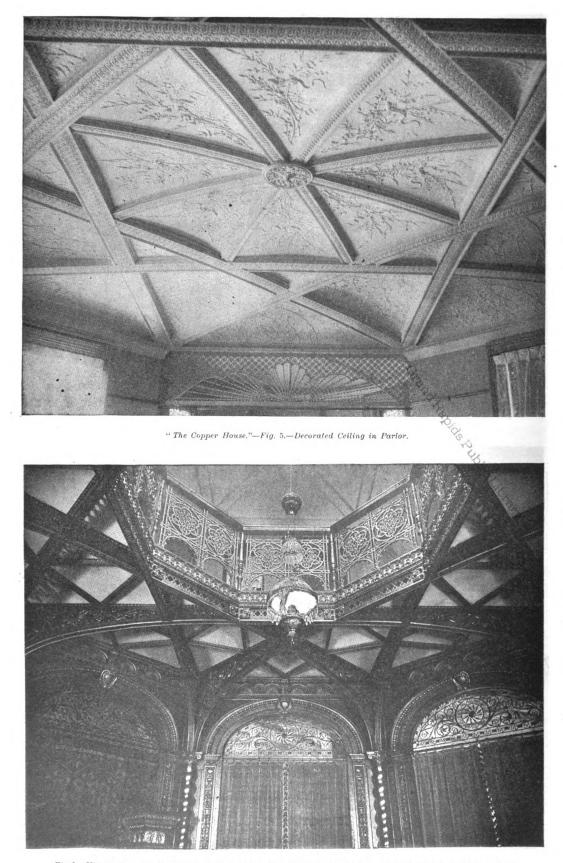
View in Main Hall, Showing Ceiling and Ornamental Railing About the Circular Opening at Second Story.
